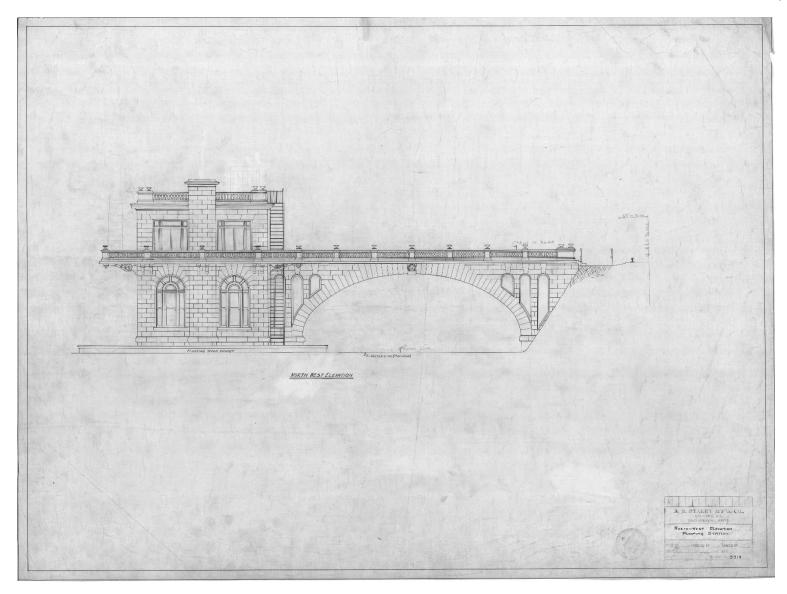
North-West [West] Elevation; Pumping Station (AES, Drawing No. 5319, [1919]).
